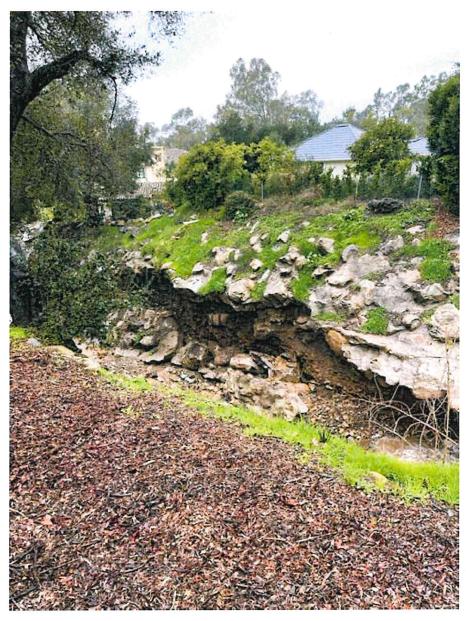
View of west bank of Romero Creek taken from east bank. Note the scour and broken sections of the grouted rock slope protection.
